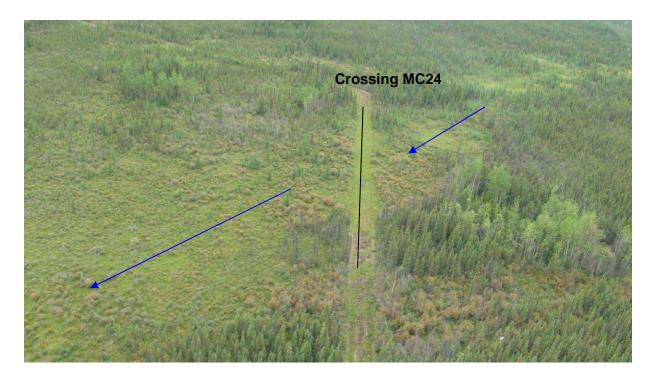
Drainage 16 looking north west at proposed crossing site MC24
